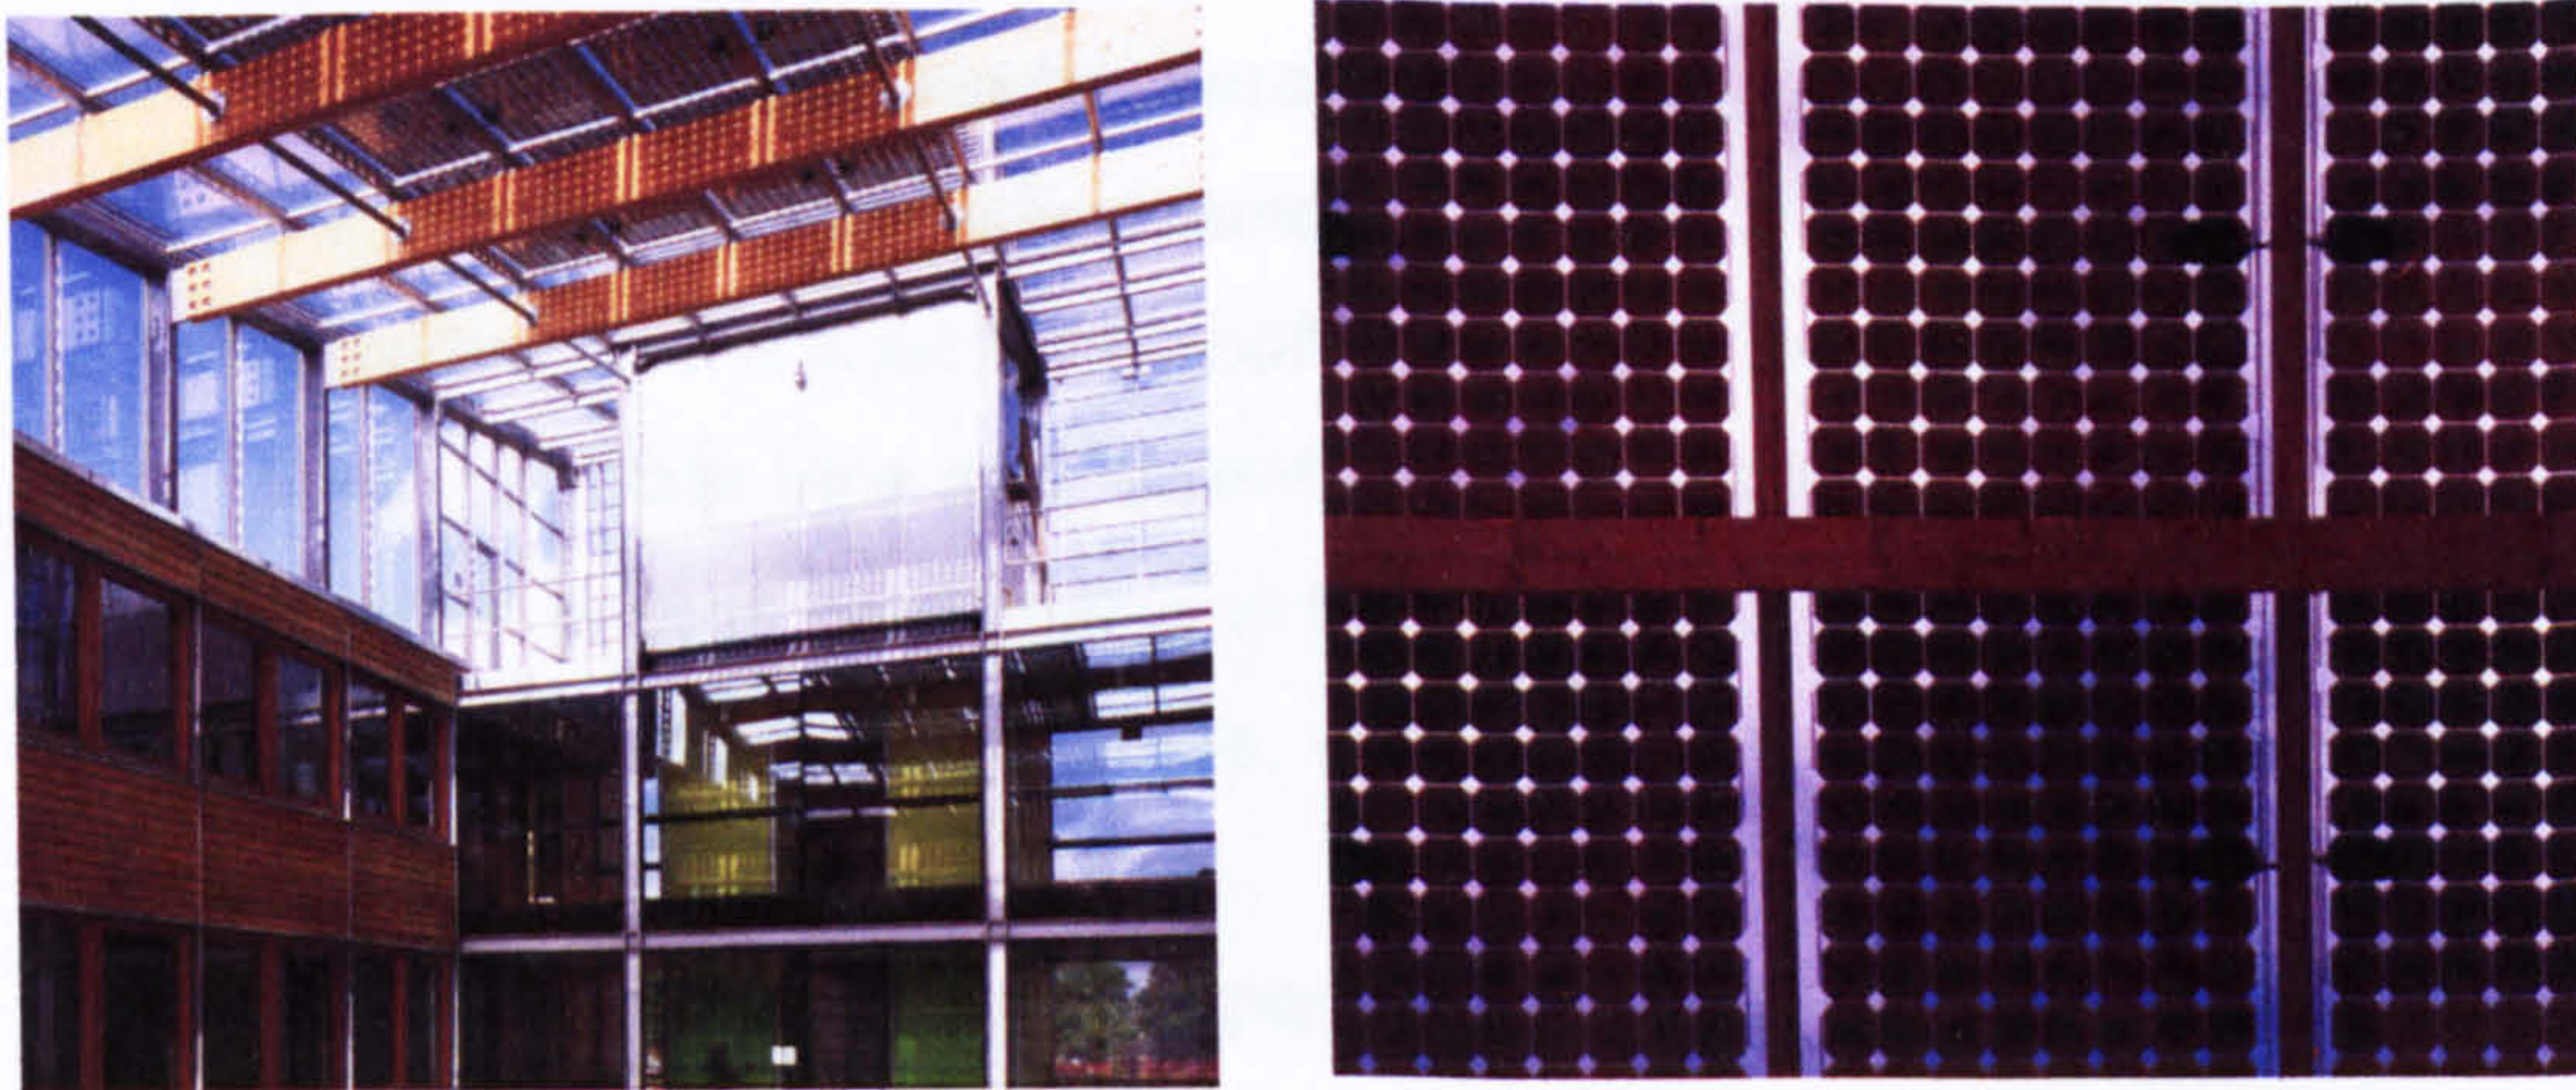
[a-b] Jubilee Campus building – roof integrated transparent PV modules
